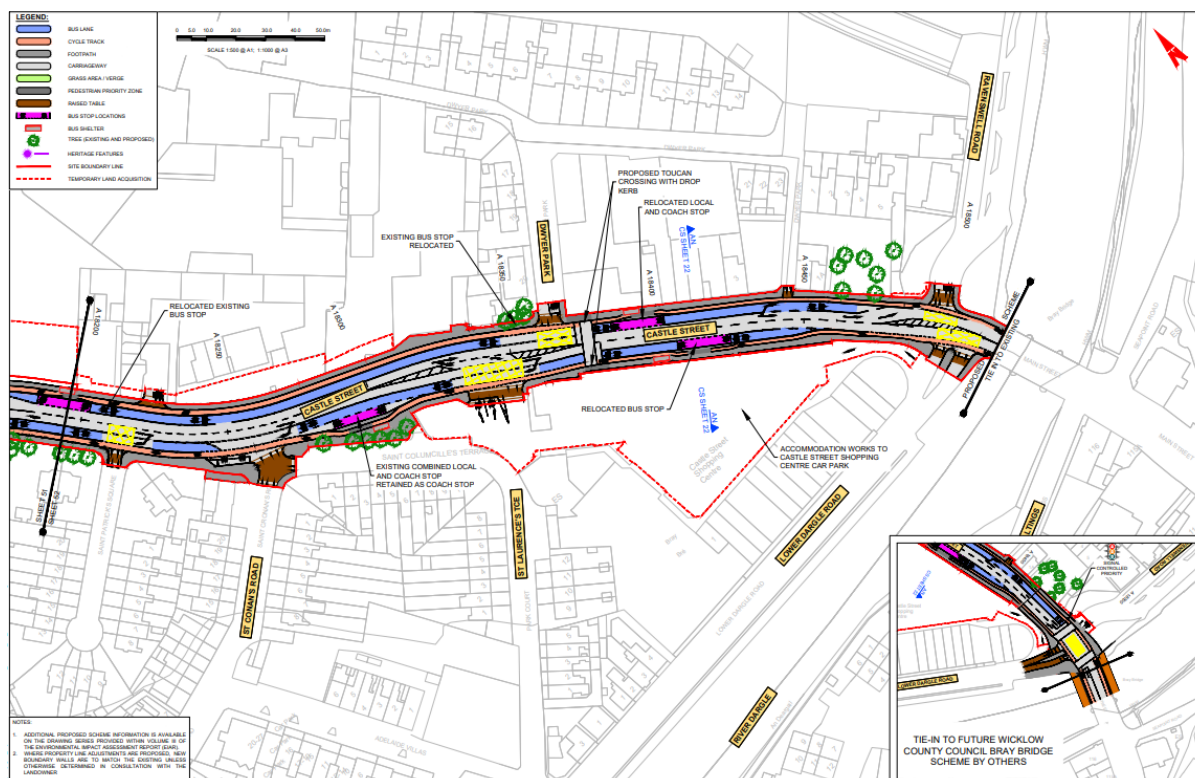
Extract from General Arrangement Drawing on Castle Street, Bray (Sheet 52)
